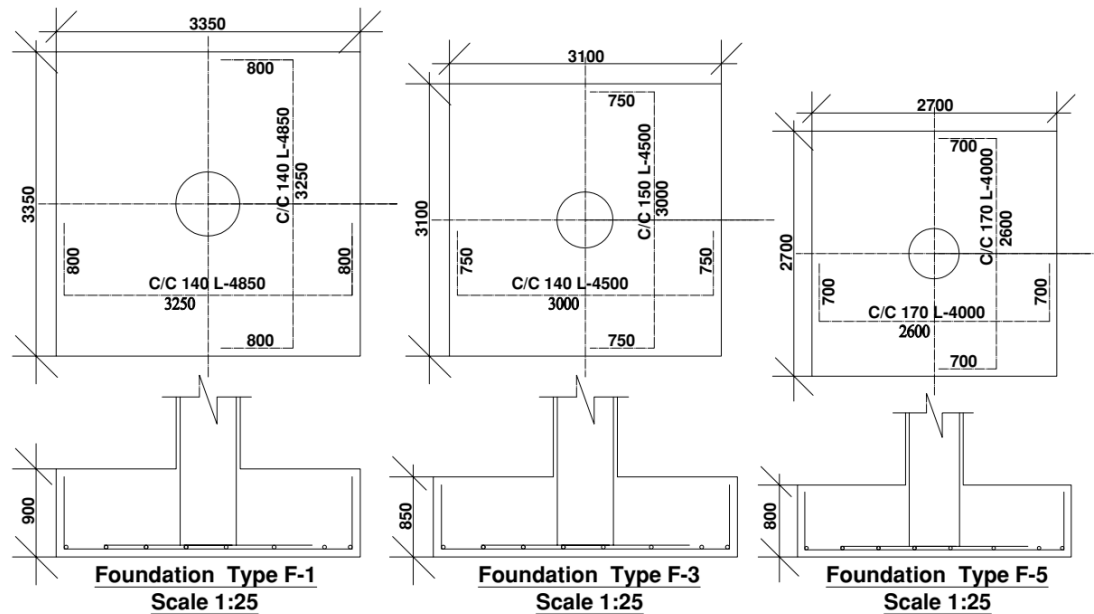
Sample foundation detailing for G+7 building with C-25 concrete
